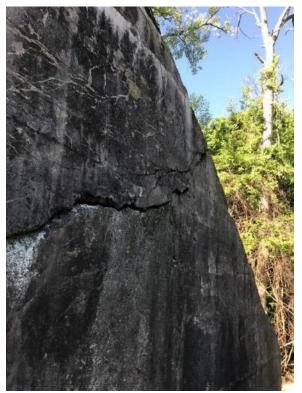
View of a measurement of the LT spillway abutment wall tilt.
